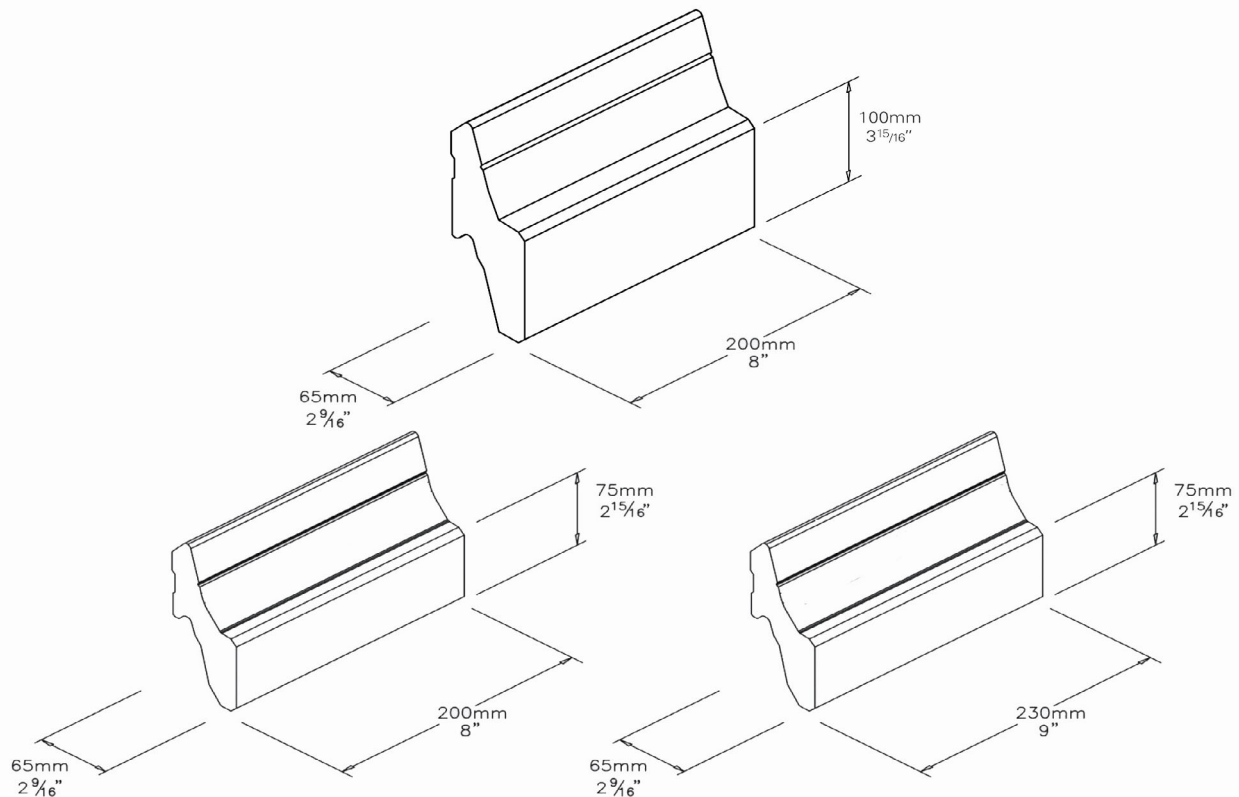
"Novabrik" Concrete Brick Masonry Unit
